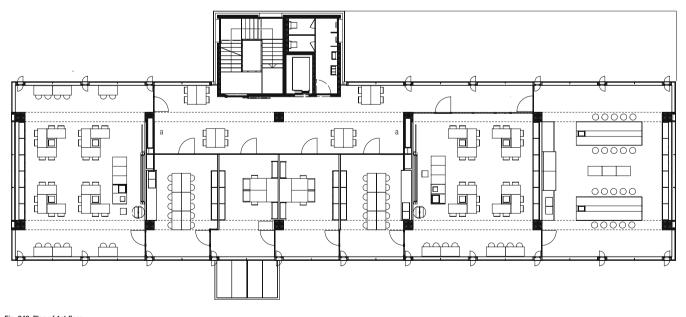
Plan of 1st floor Lobby adjacent staircase and corridor to room at east end of building a) Vertical service shafts
